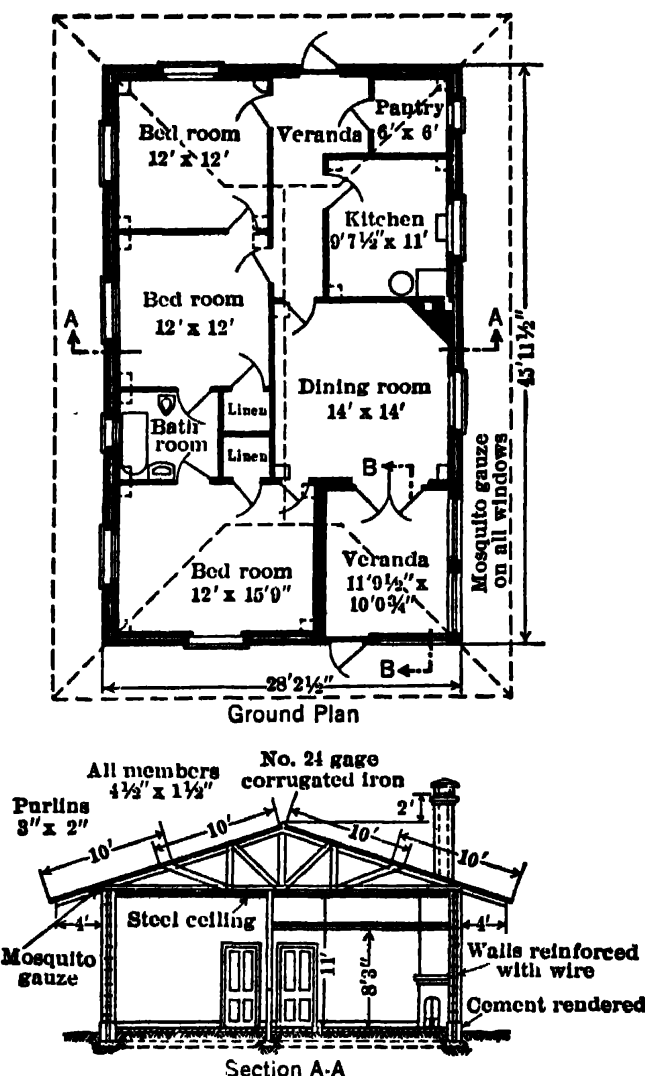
Five-room Brick House, Roan Antelope Mine, Luanshya, Nor Rhodesia (67)
